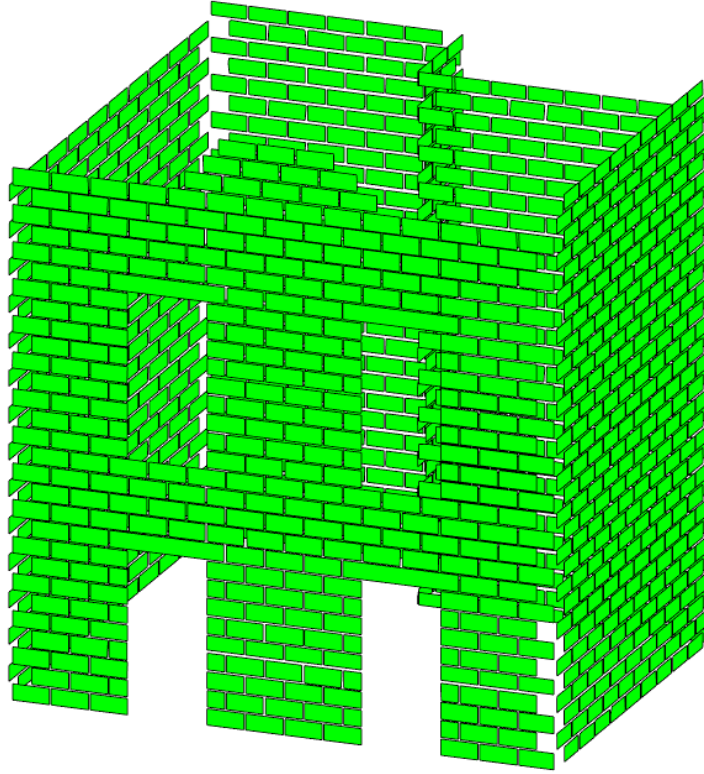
The outer wall surfaces of the example single-wythe masonry structure with the small corner bricks removed for modeling of structural interlocking between walls.
